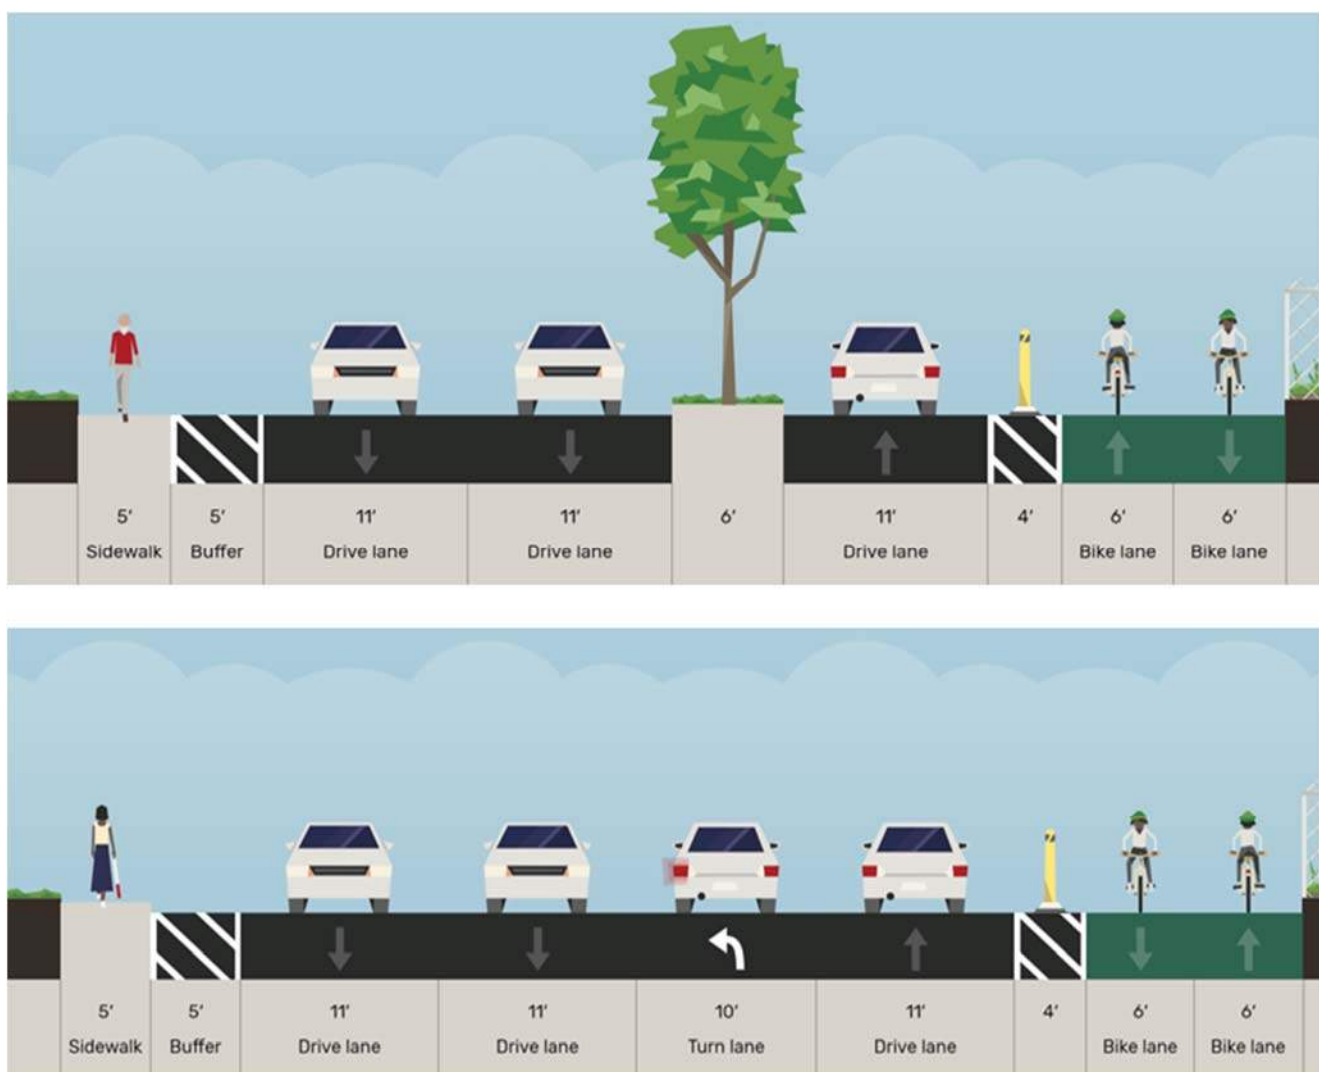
Two-Way Separated Bicycle Lane on East Side of New Design Road (Top – Mainline; Bottom – Intersection)
